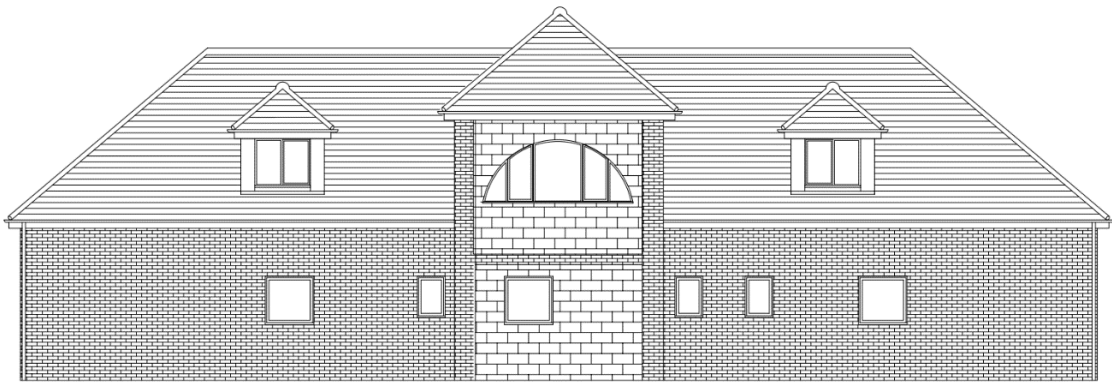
Proposed western elevation with inclusion of new windows into all habitable rooms
